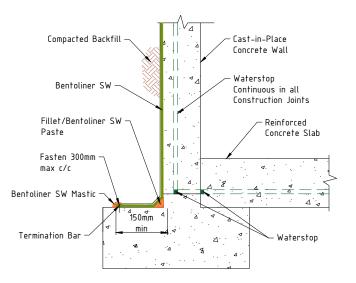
Slab on footing detail at non-hydrostatic condition
